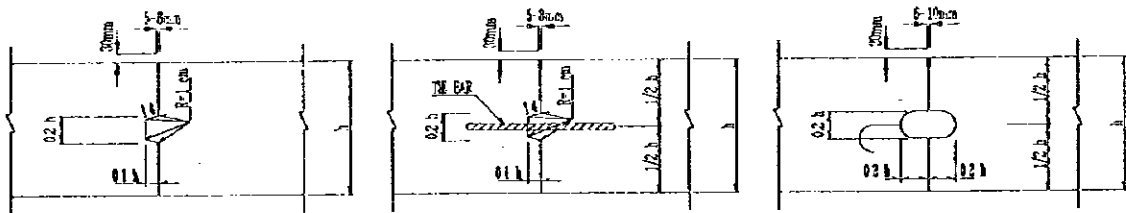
Structure of Longitudinal Construction Joint
